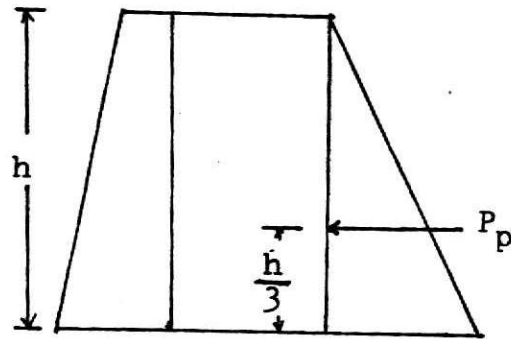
Retaining wall with vertical wall and horizontal backfill
